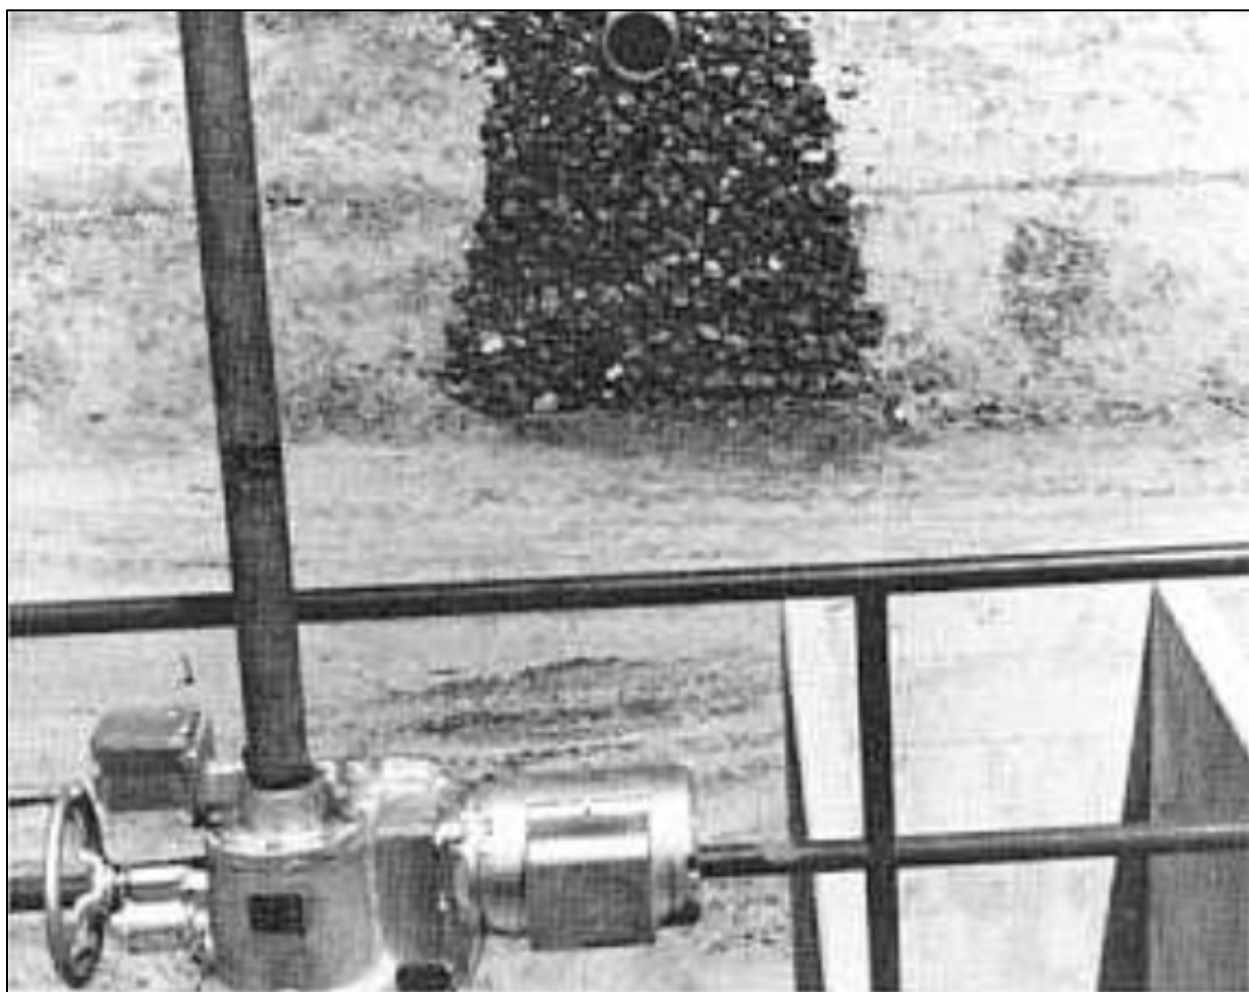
The photo shows a metal drain line placed into an earthen canal to drain off excess water in an unknown Reclamation project. This simple system requires no gates but drains water into an adjoining wasteway when the canal water reaches a certain height.²⁵⁵
